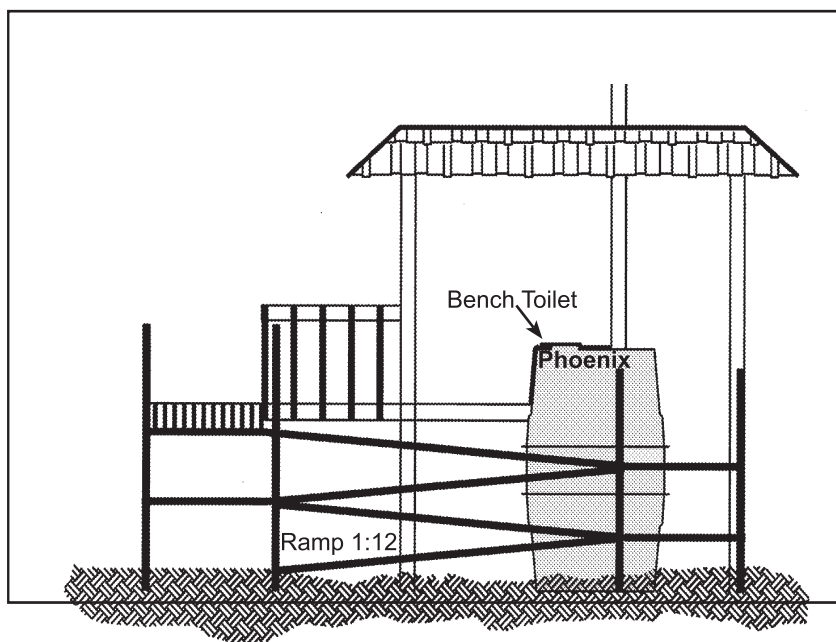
An elevated toilet building with a bench toilet and a ramp for universal access.
